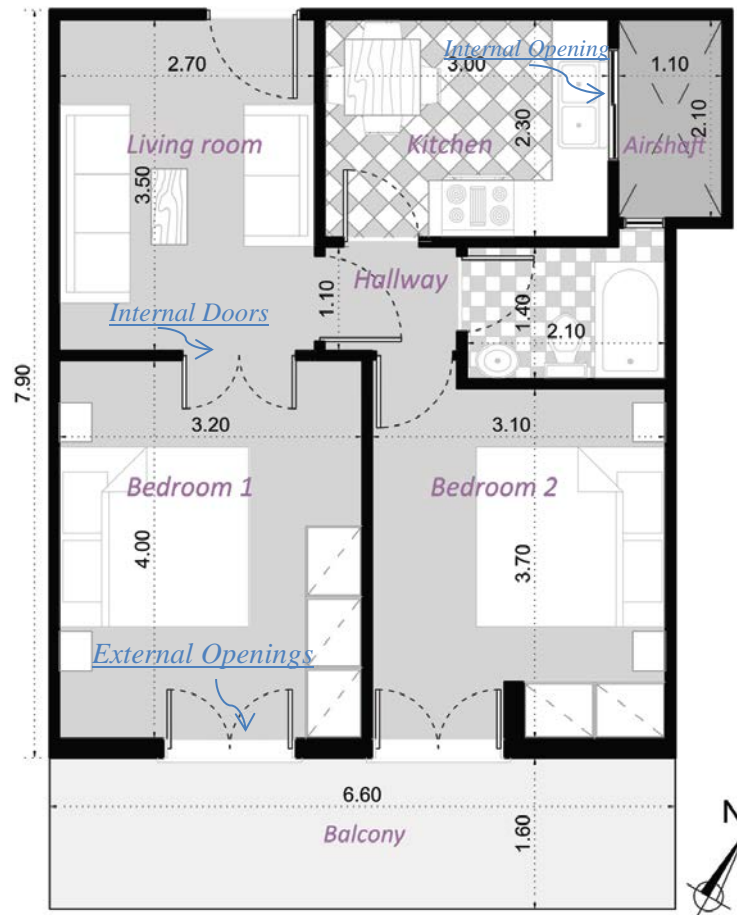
Floor plan of the case study apartment, internal openings and area of spaces (m)
